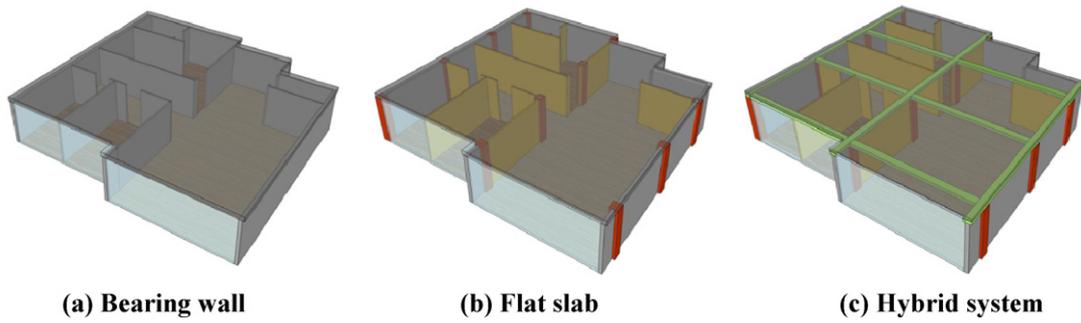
Unit floor plans in bearing wall, flat slab and hybrid systems.
